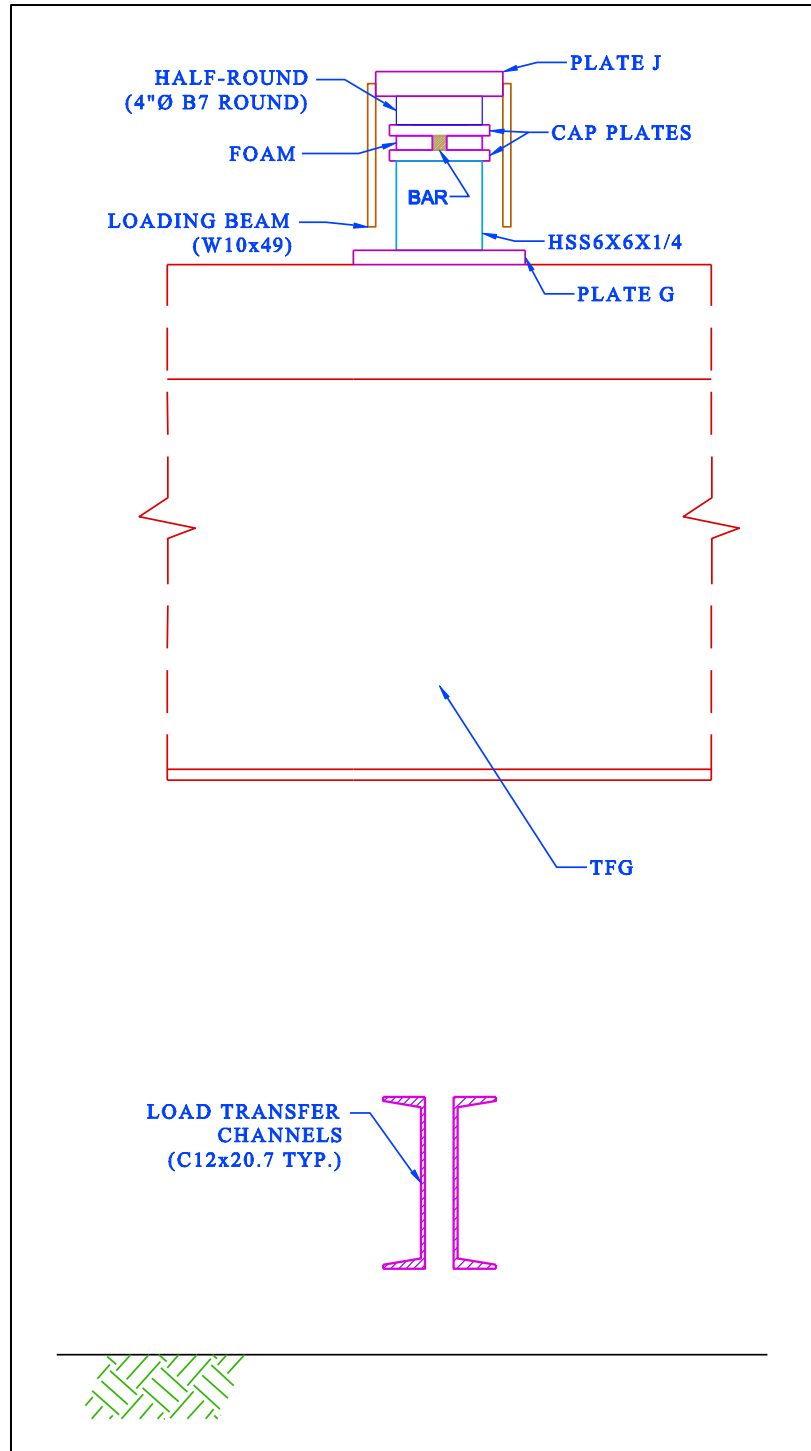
Longitudinal plane cross section view of load bearing assembly at Section B
